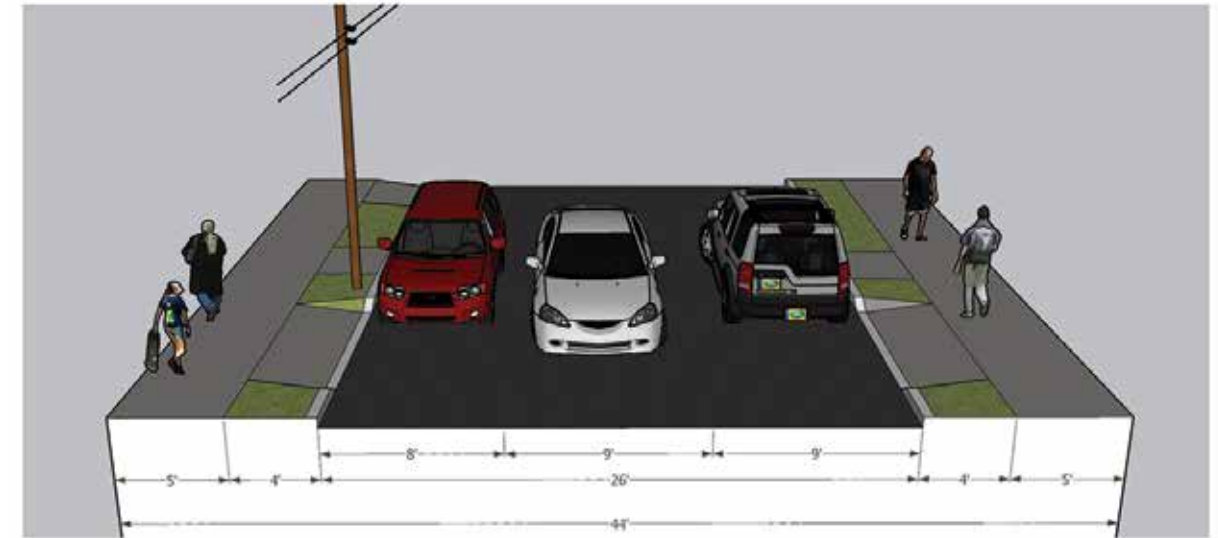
Main Avenue : Crane Street to Willett Street Concept 1 (Option 3) Cross-Section
